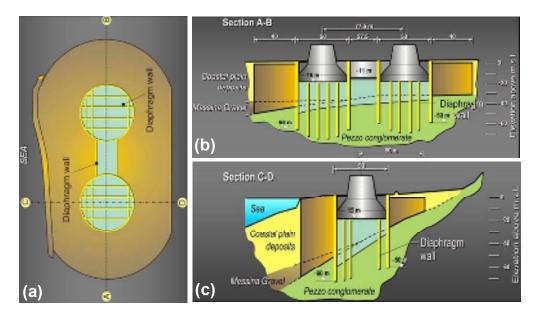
The Calabrian Tower foundation : (a) plan view, (b) transverse cross-section, and (c) longitudinal cross-section (courtesy of M. Jamiolkowski).
